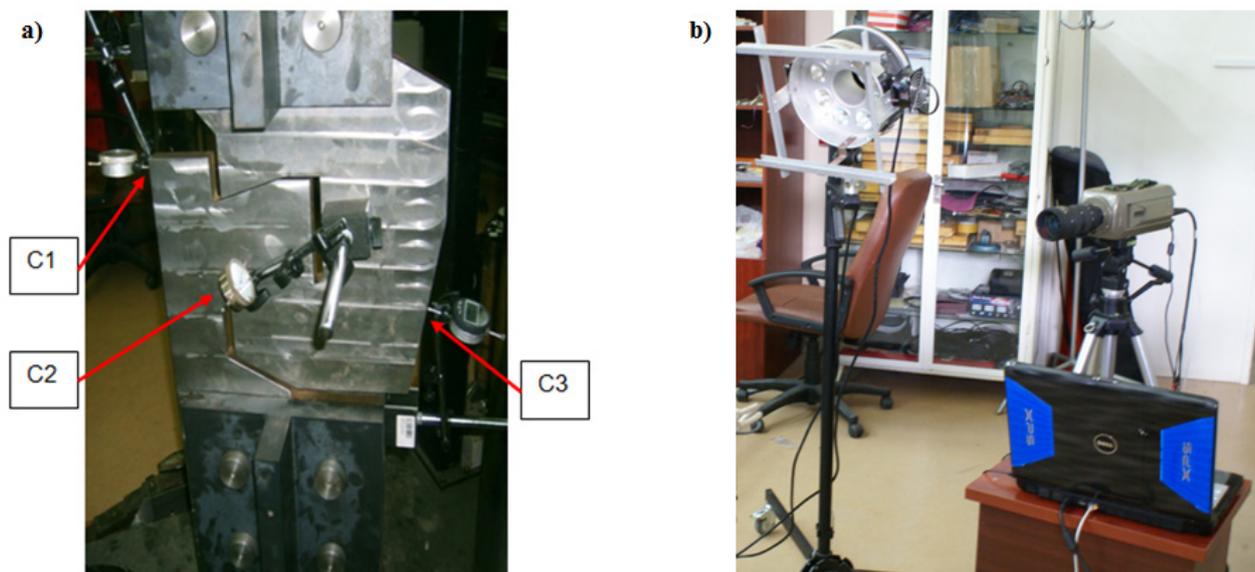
Photos of the tested components of the side lock and the test stand view with INSTRON SATEC machine: a) hook-shaped connector with the measuring equipment, b) additional stand equipment: black-and-white camera to high-speed and high-resolution images Phantom V12 with halogen lamps
